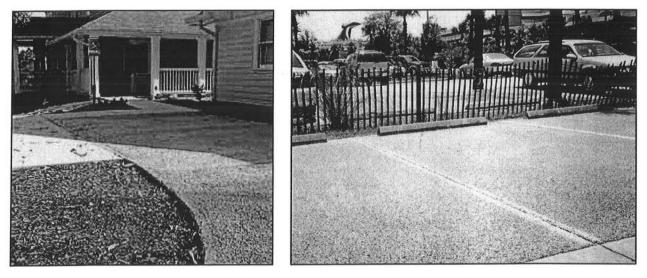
Typical Porous Concrete System Applications (Photos by Bruce Ferguson, Don Wade)
